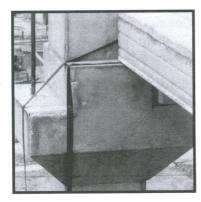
Column/Column Connection With Beams Onto Corbel
